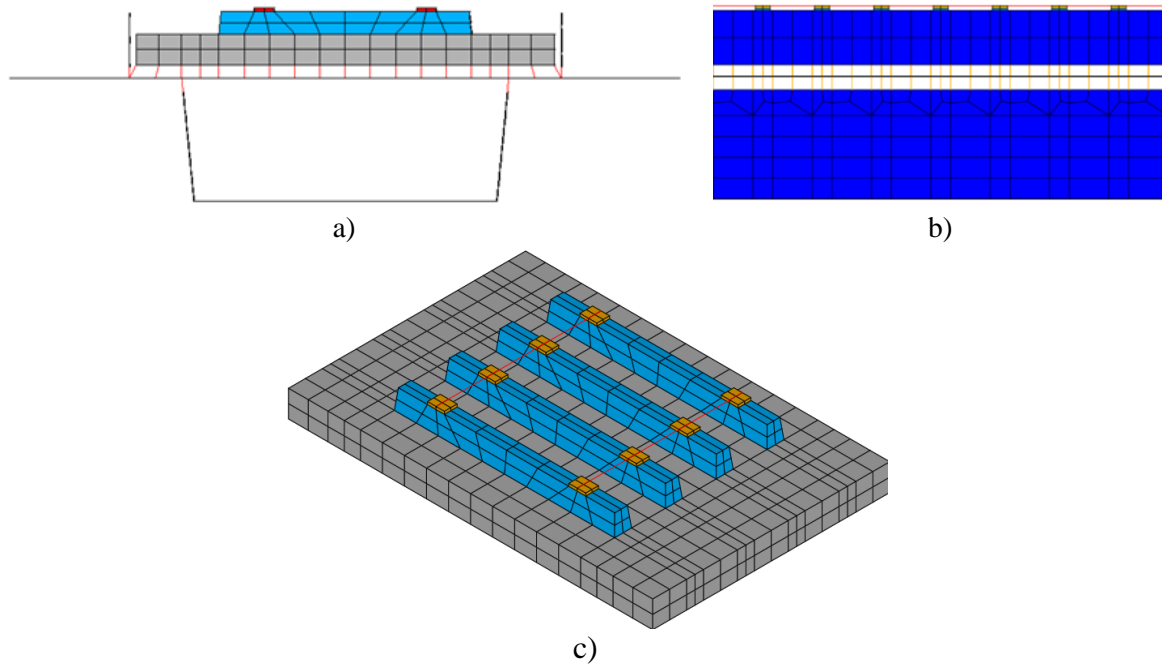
Detailed views of new FE mesh adopted for span 2: a) cross section; b) lateral view of the beam-slab connection area; c) track components
